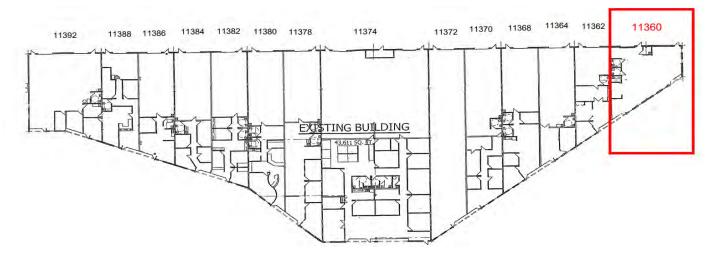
Floor layout of the current building, showing the various tenant spaces, with the subject space outlined in red.
